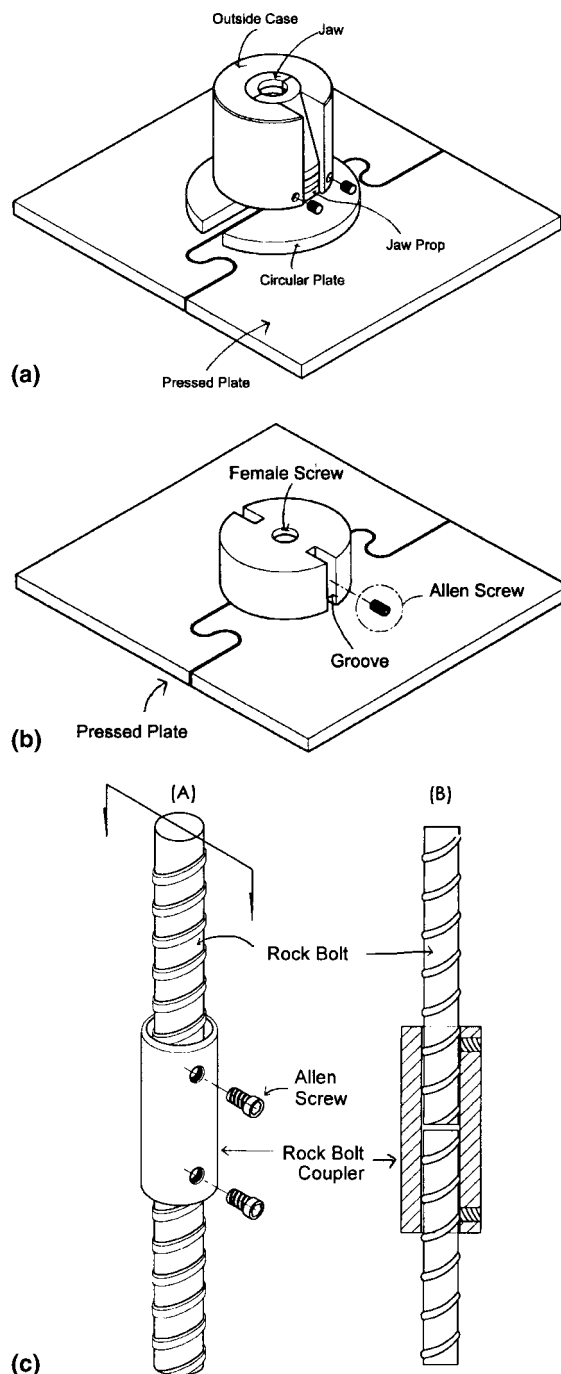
Main Components: (a) Main Retaining Assembly; (b) Auxiliary Retaining Assembly; (c) Splicing of Rock Bolts
